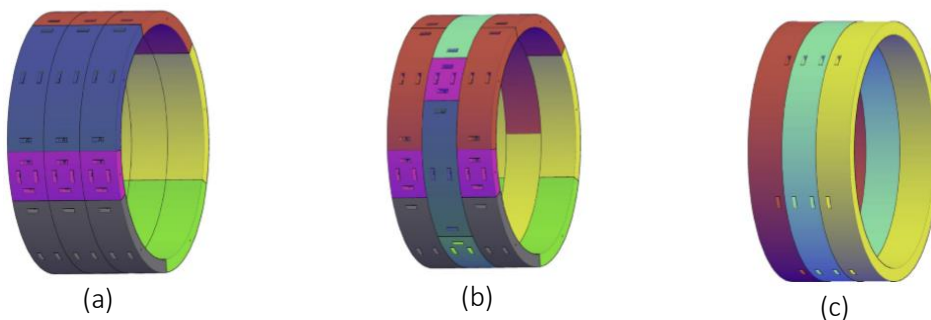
Joint segmental ring models (a) straight jointed ring; (b) stagger jointed ring; (c) uniform ring (Fei *et al.* 2014).
